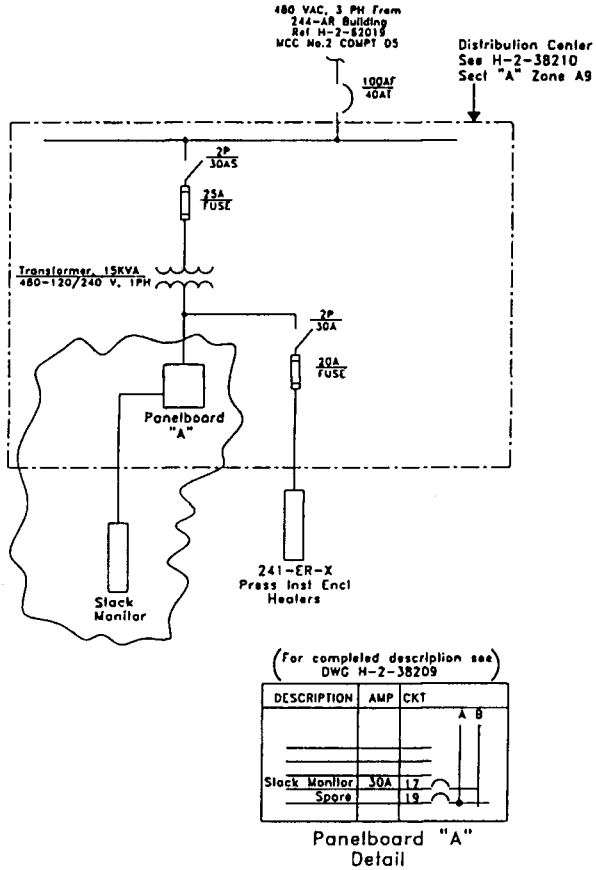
244-A DCRT GEMS Upgrade - Electrical One-Line
